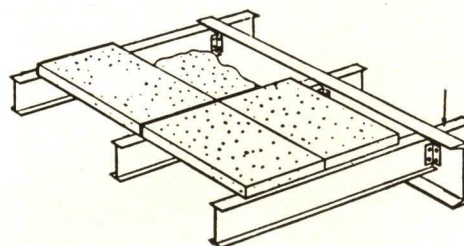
Zonatile Precast Concrete Roof Tile over bulb tees.
